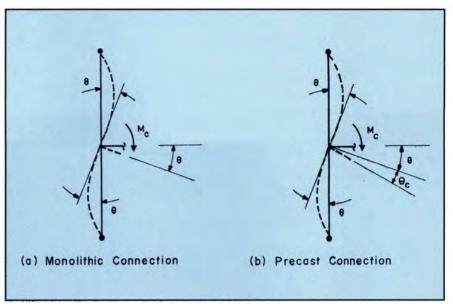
Deformation characteristics of monolithic and precast concrete connections.
